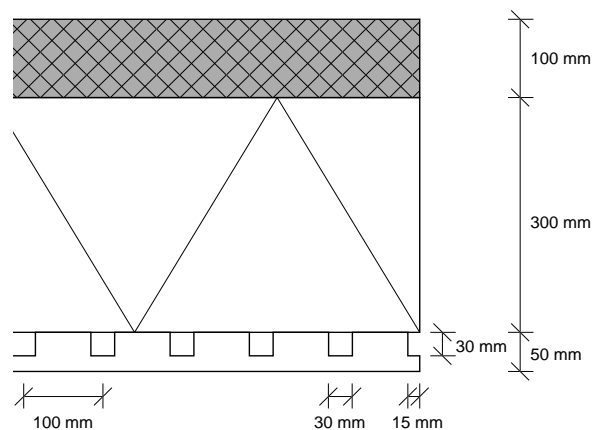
The ground slab floor constructed of a concrete slab on top of a thermal insulation layer above the new element. The combined capillary-breaking layer and the radon-suction layer are shown as the new integrated element.
